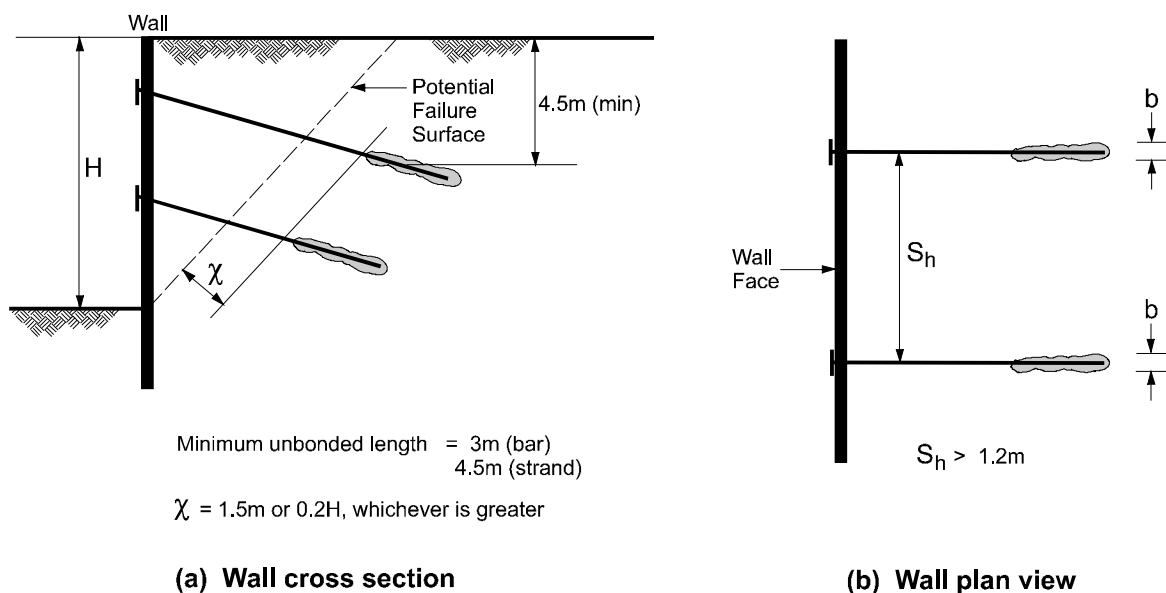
Vertical and horizontal spacing requirements for ground anchors.
